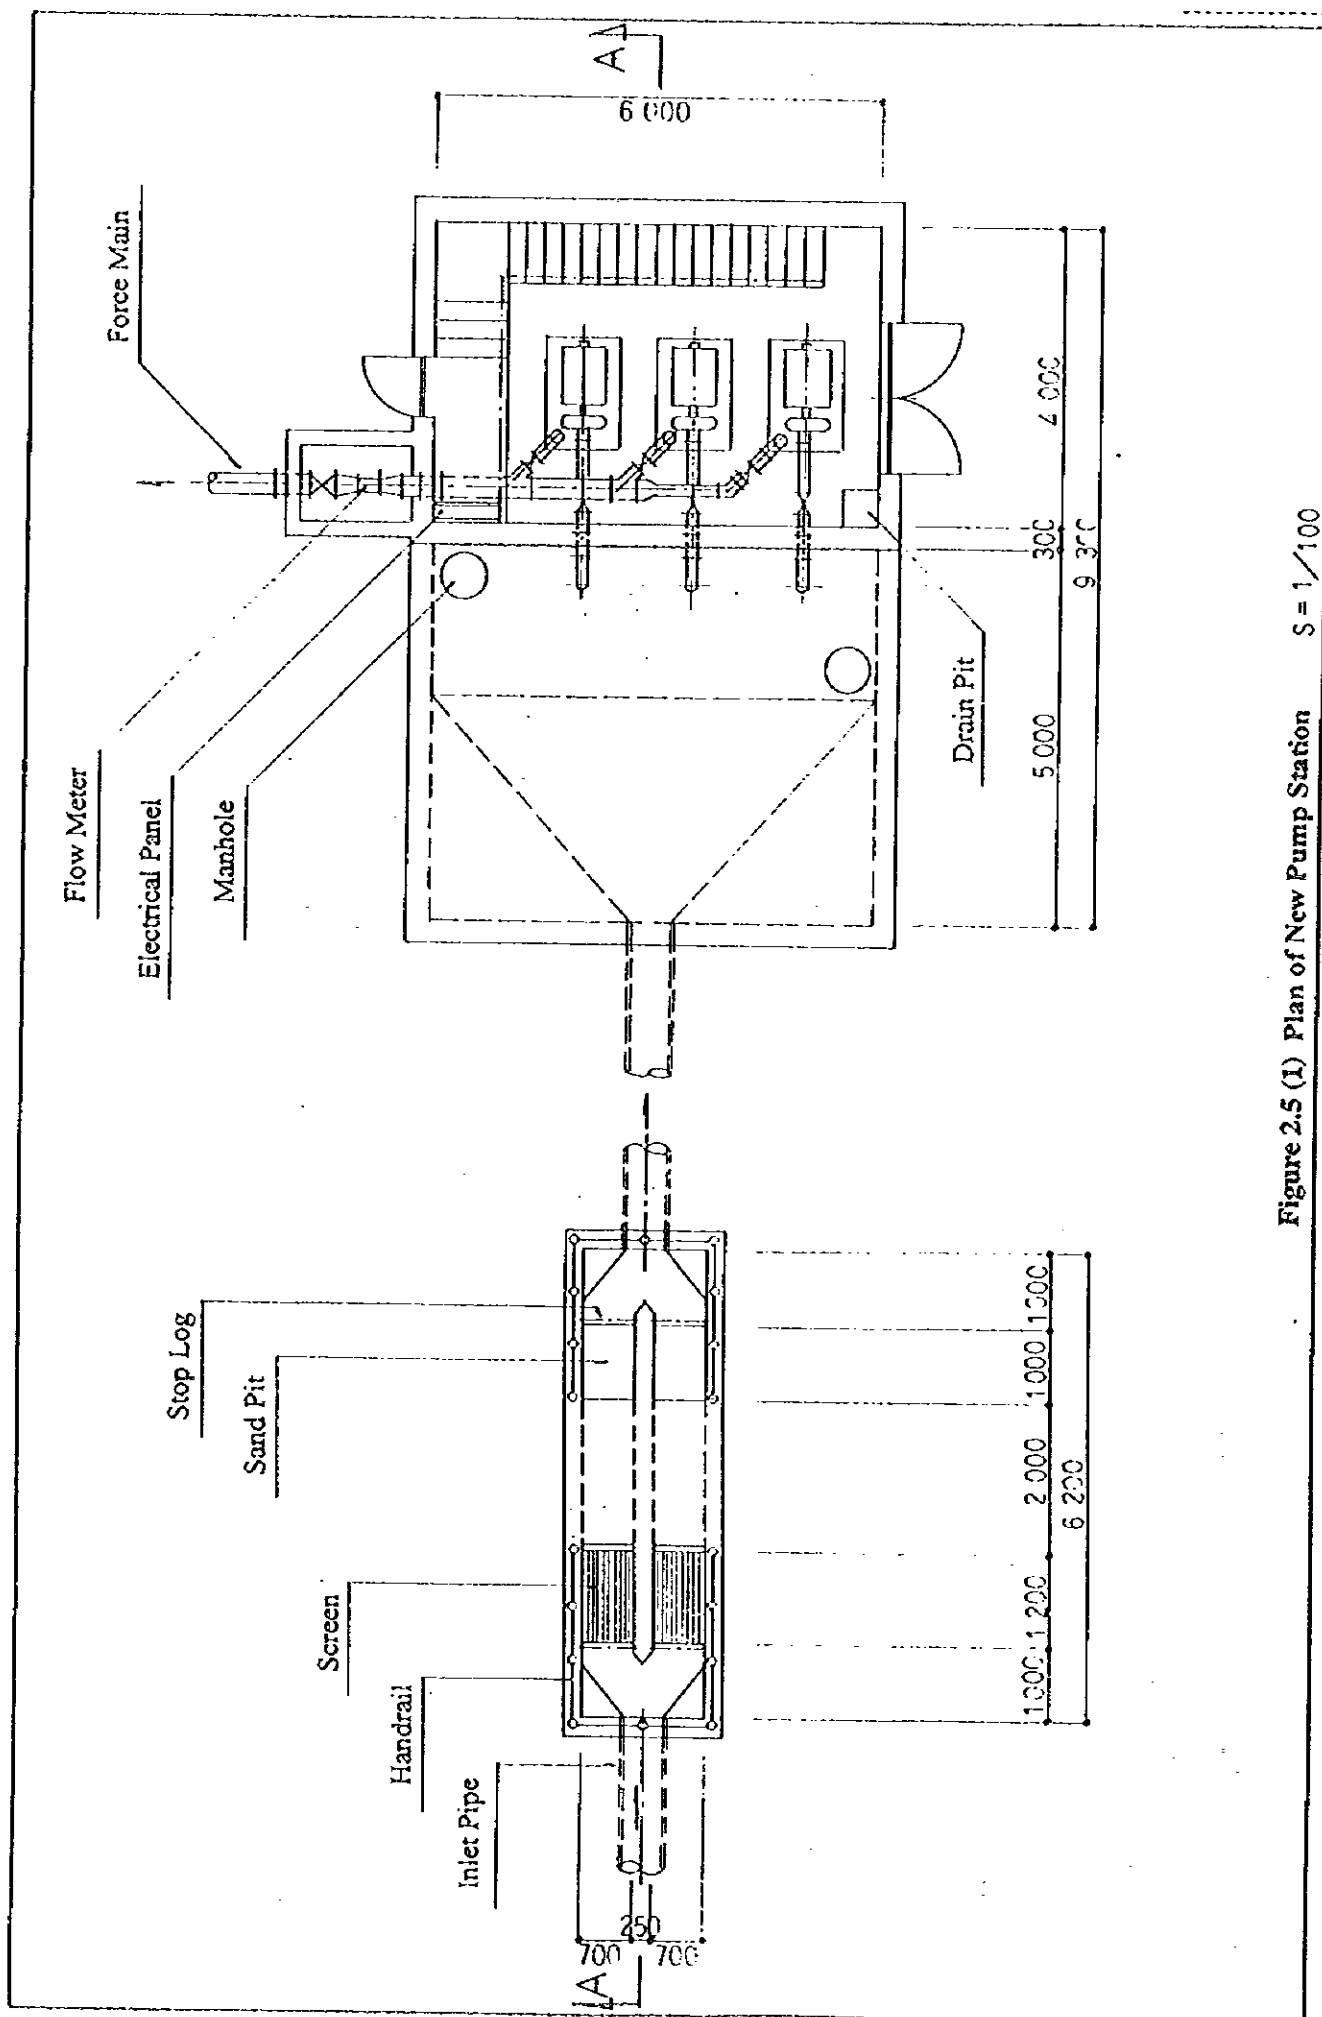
(1) Plan of New Pump Station S = 1/100
